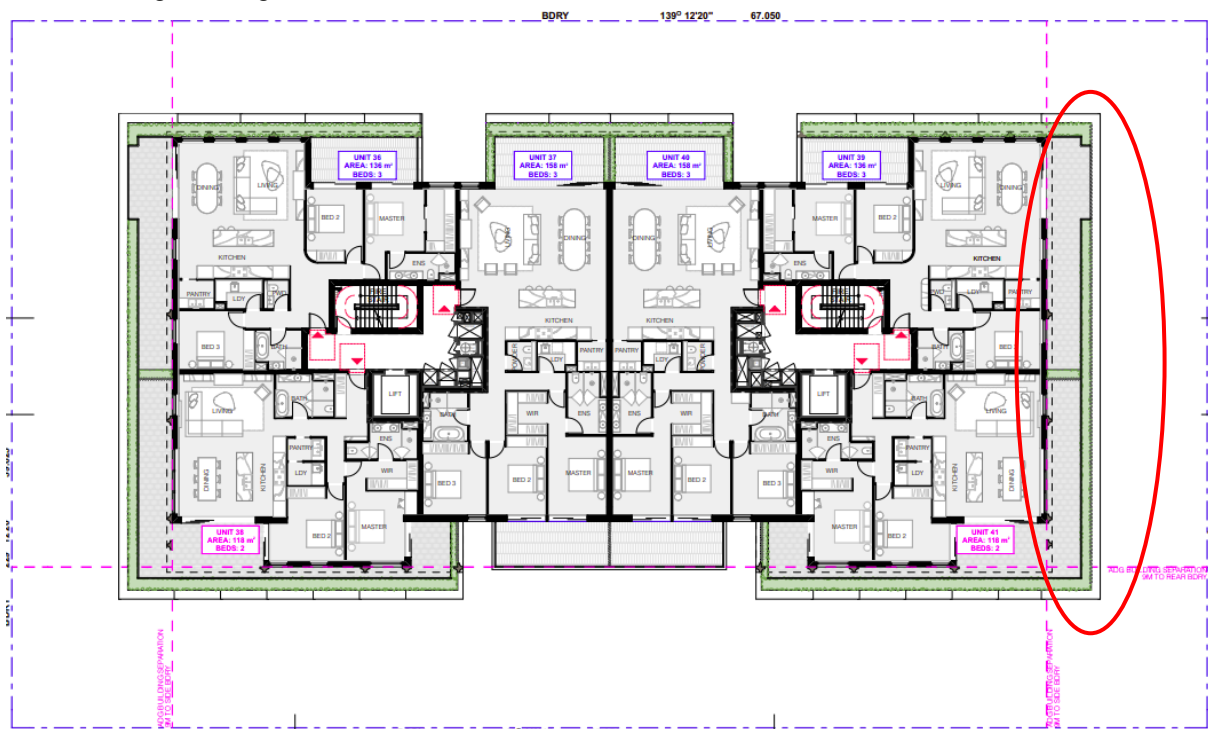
Extract of Level 5 Plan, non-compliance highlighted in red (Source: Architectural Plans - SSD-86017721)
